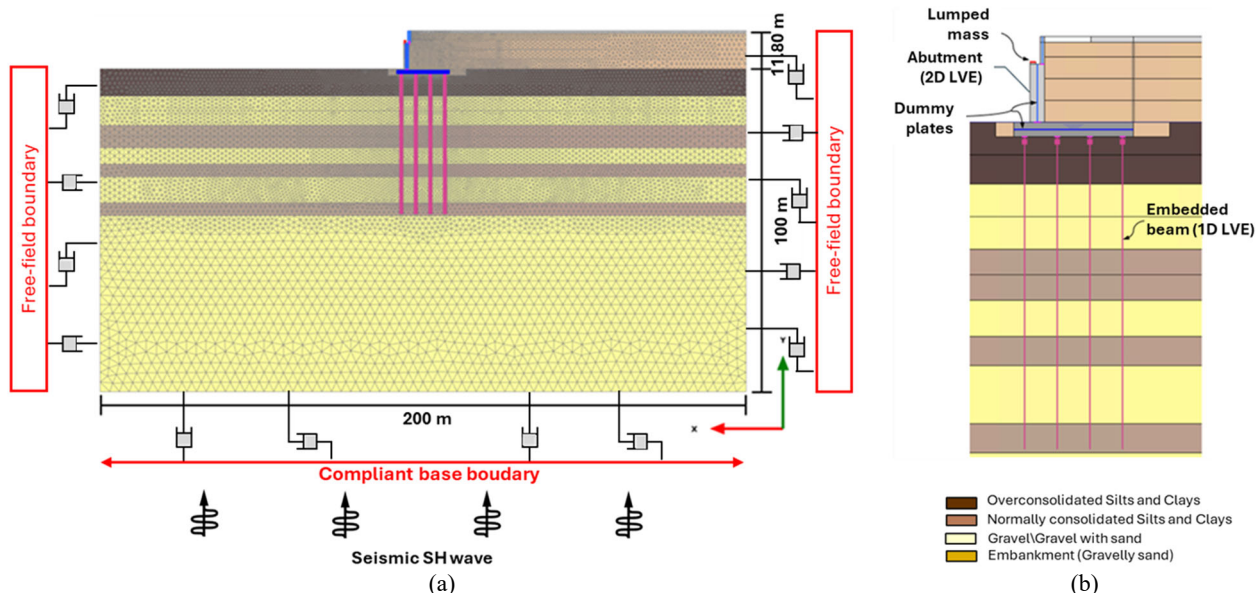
(a) Two-dimensional numerical model and (b) detail of abutment structure and its foundations.
